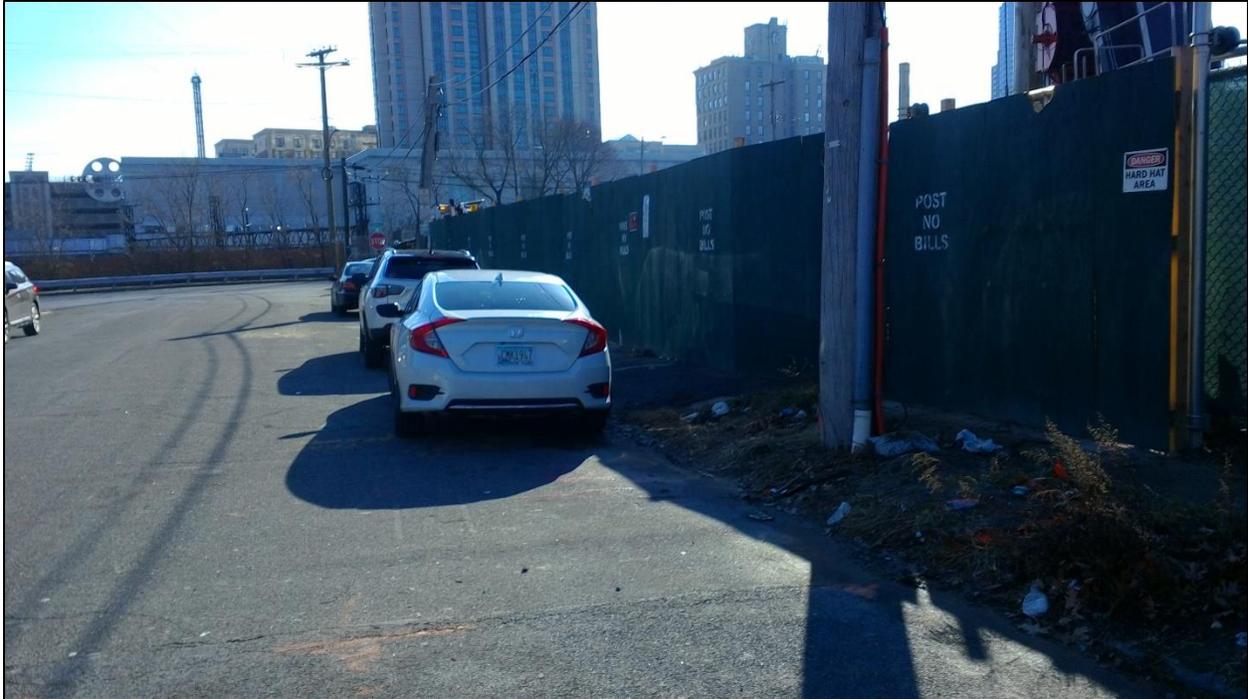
View of Construction Plywood Fence along Cottage Street; The entire site is bounded by these green plywood fences.
